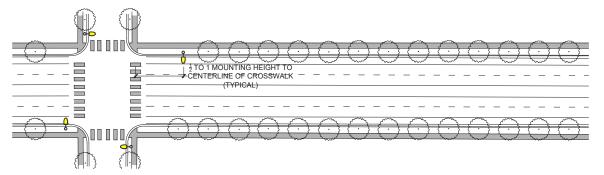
Typical Arterial with Street Lights at Intersections Only Plan
